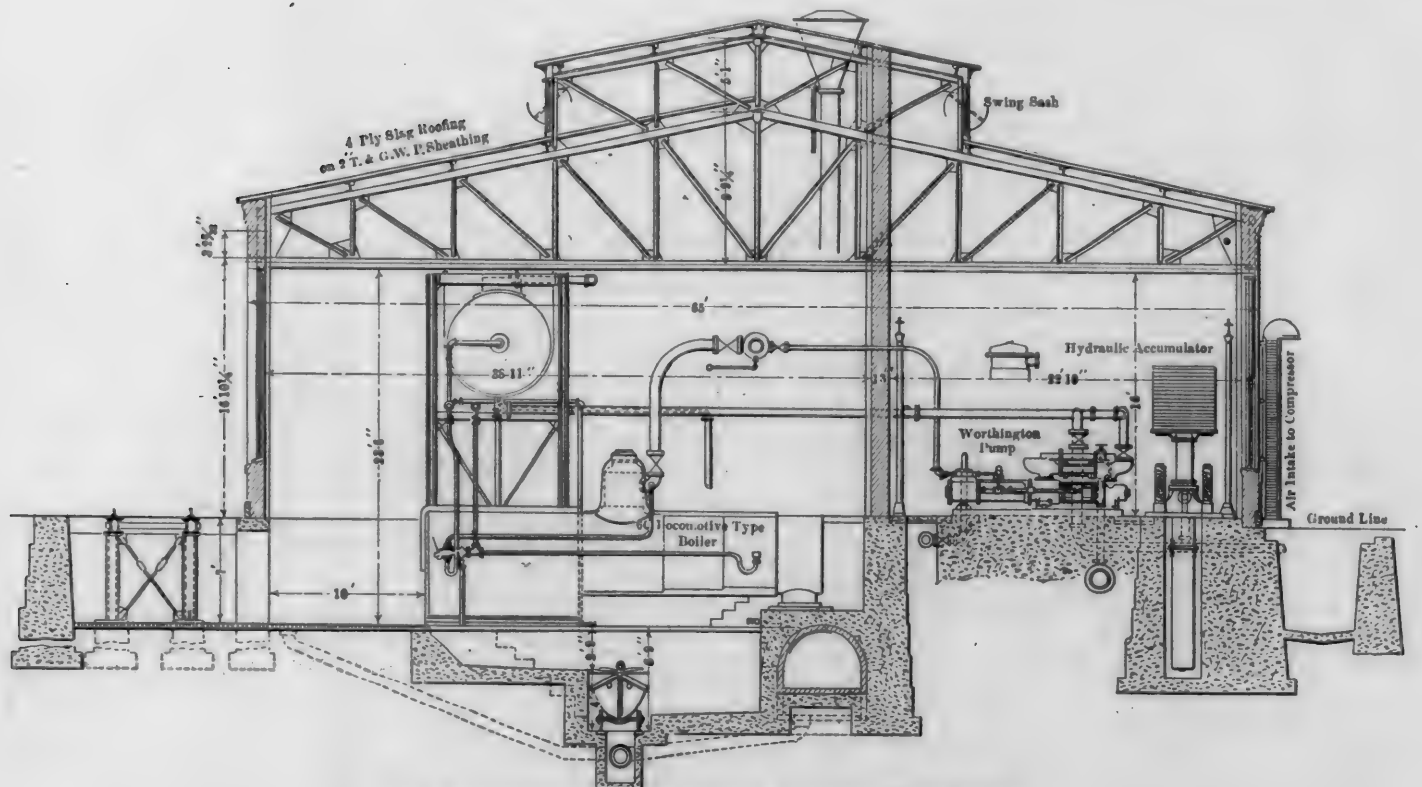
TRANSVERSE CROSS-SECTION THROUGH POWER HOUSE.
